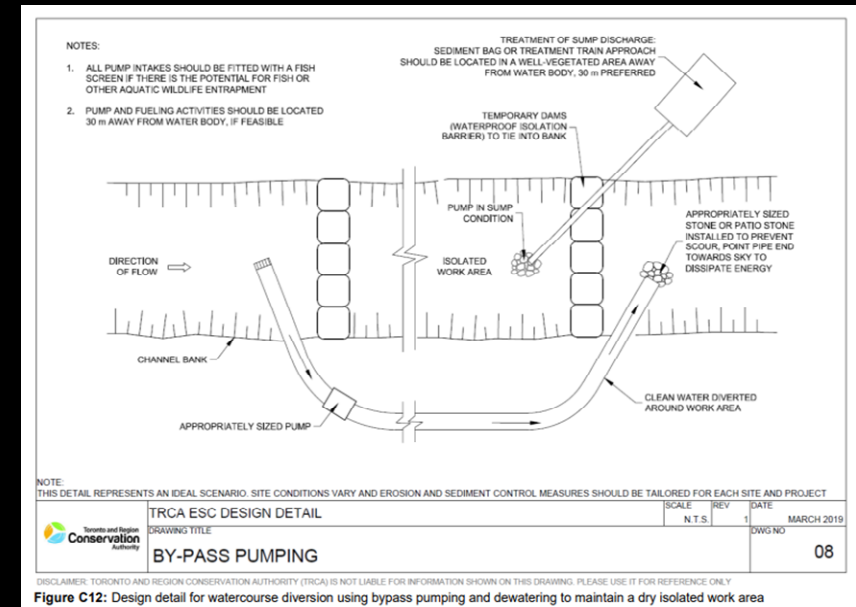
Design detail for watercourse diversion using bypass pumping and dewatering to maintain a dry isolated work area
